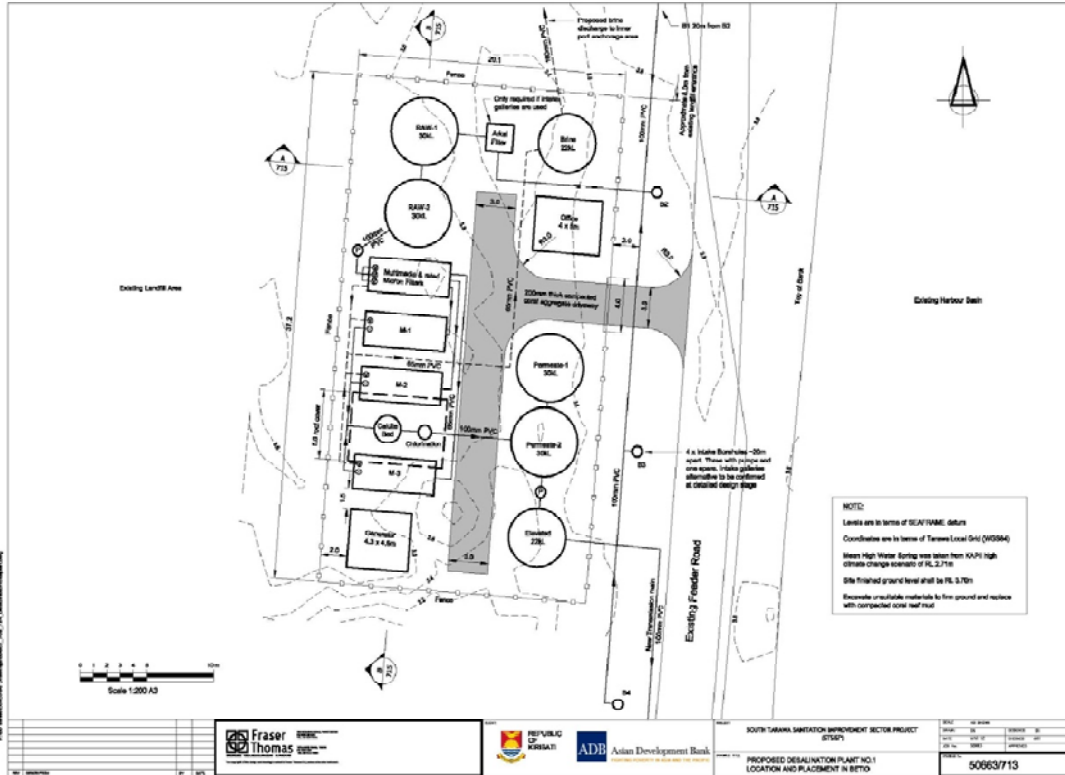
Desalination Plant No. 1 - Site and Contour Plan
